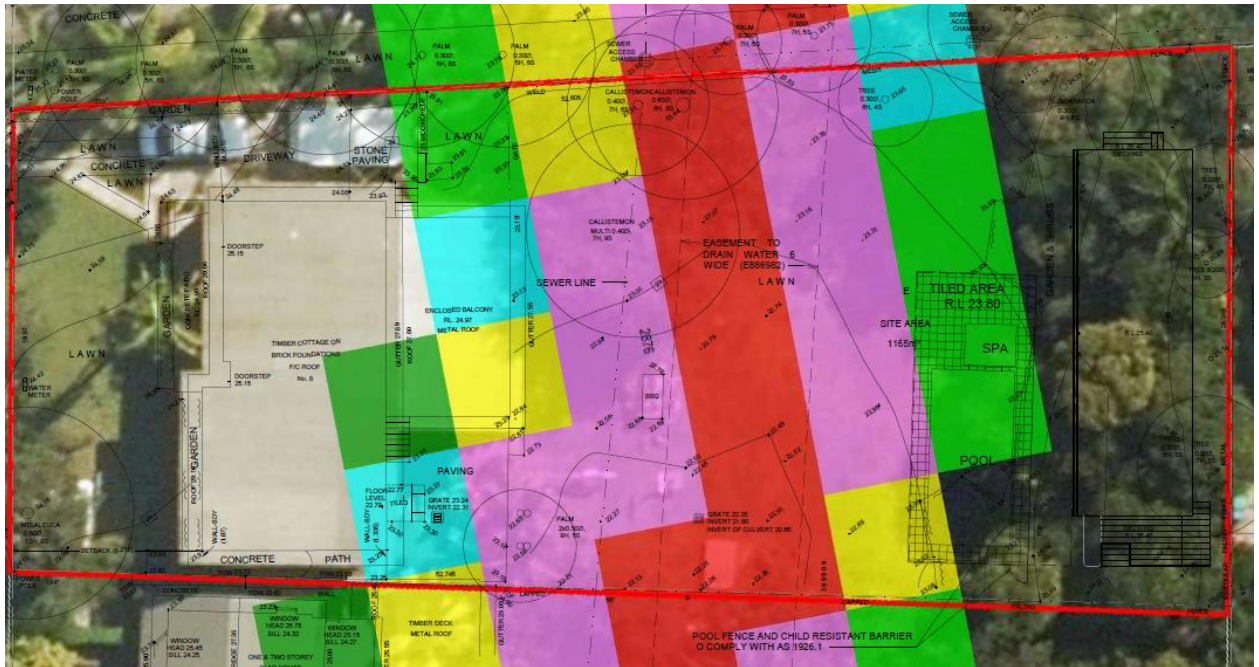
Ground floor plan overlay with Flood Life Hazard map
